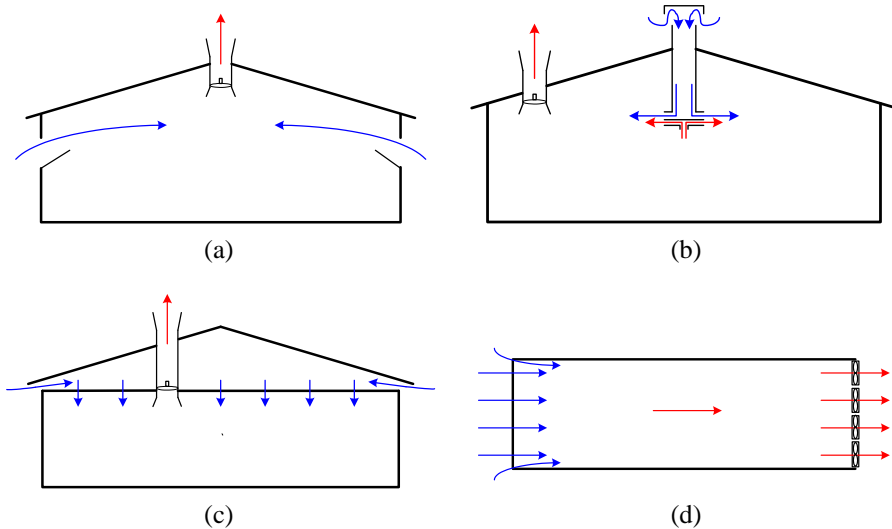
The Negative Pressure Ventilation Type Normally Used in Livestock Buildings (a) Wall Inlet (b) Roof Inlet (c) Diffuse Ceiling (d) Tunnel
